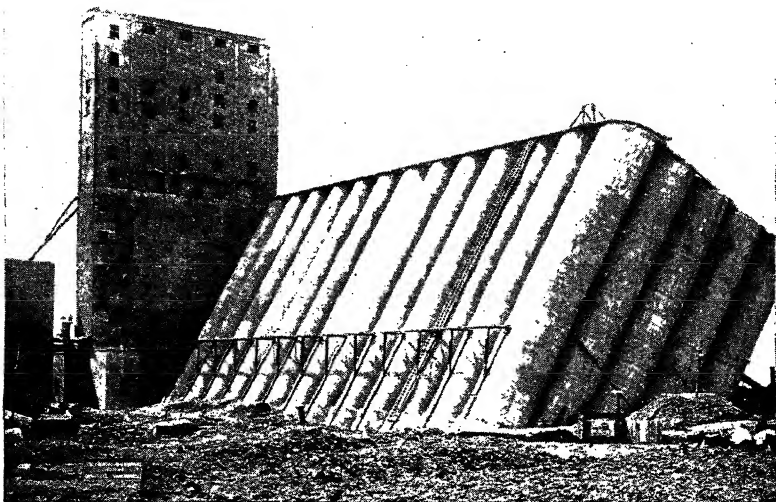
Winnipeg grain elevator after foundation failure. (Courtesy of Foundation Company.)
